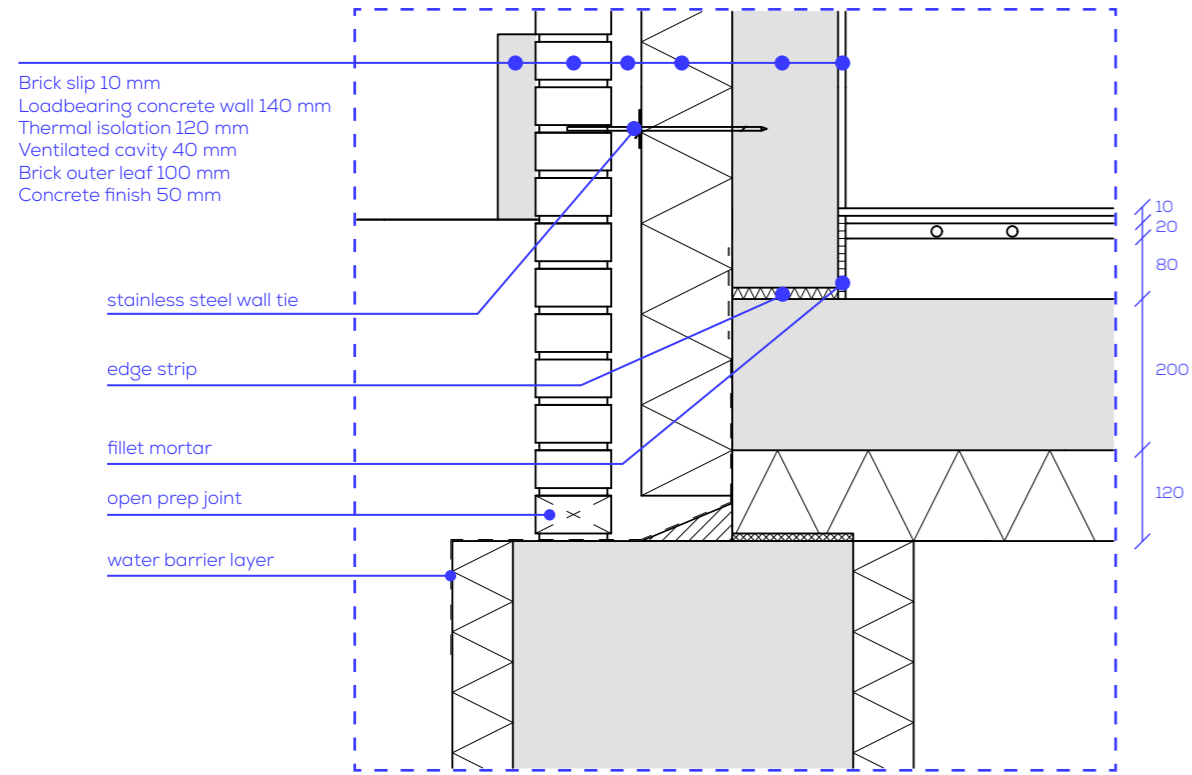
Vertical foundation detail V.004, drawn on scale 1:5, scaled to 1:10
